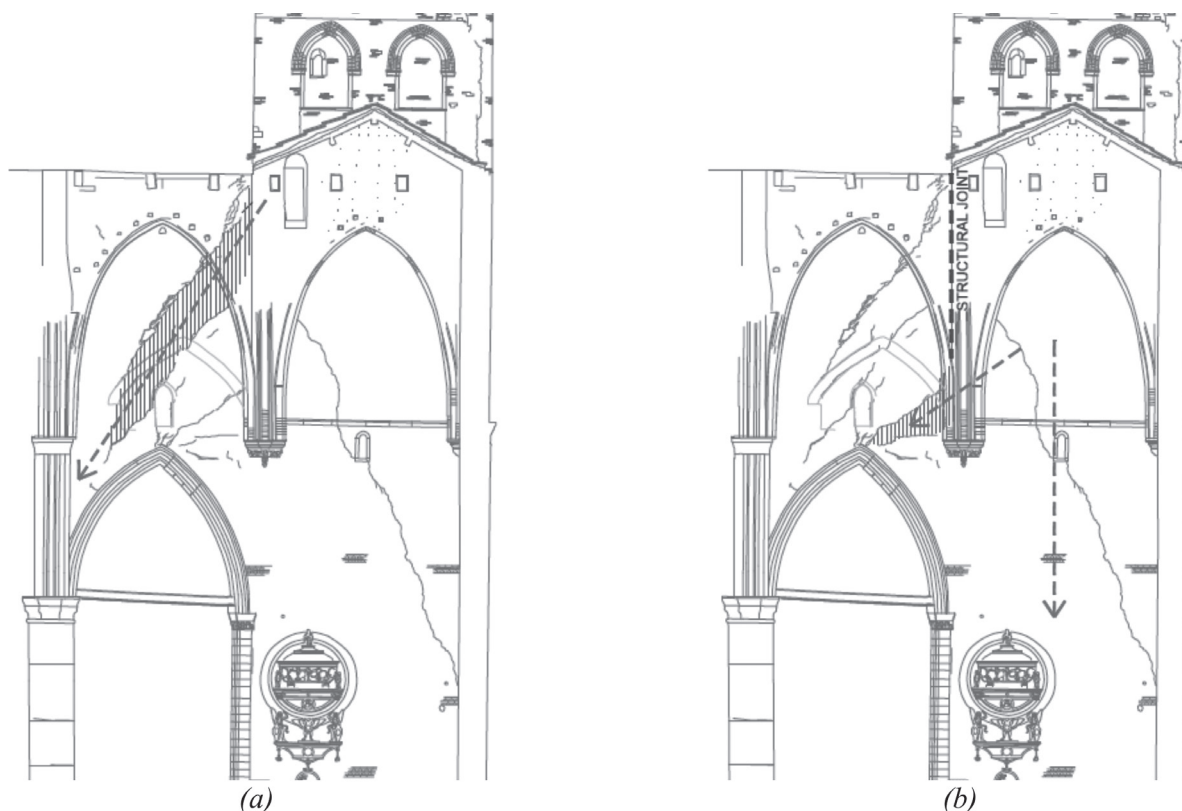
Direction of the thrust between the bell tower and the basilica: a) before the structural joint execution, b) after the structural joint execution.
